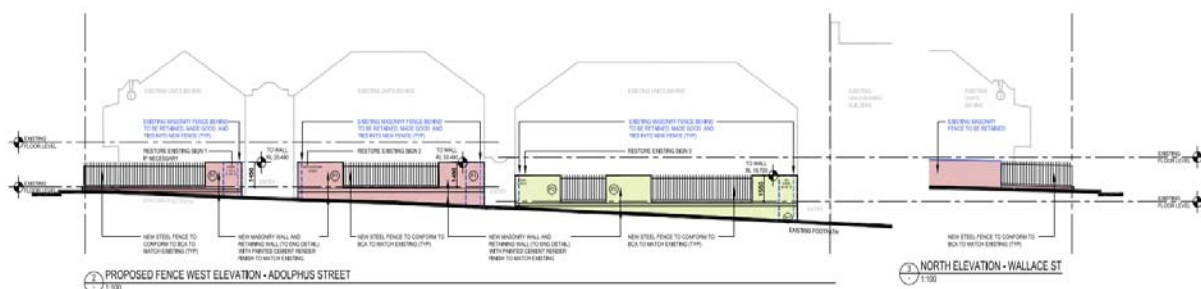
Proposed new retaining wall / front fence to match existing at 18A Adolphus Street, Balmain
